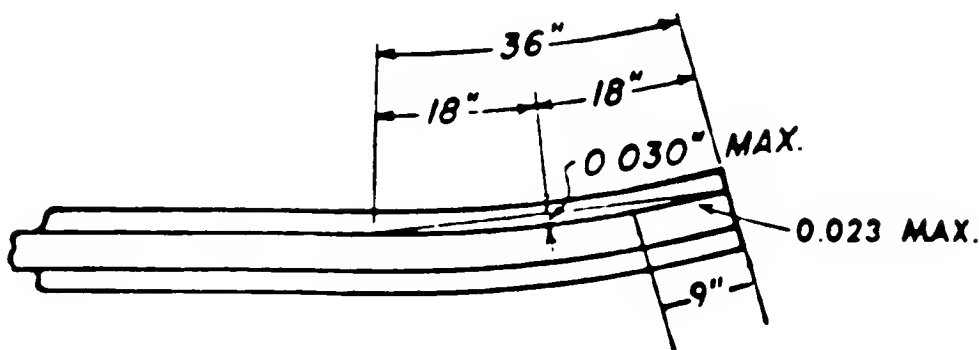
Top View of Rail Lateral (Horizontal) Line Tolerance at Rail Ends per Section 13.5
